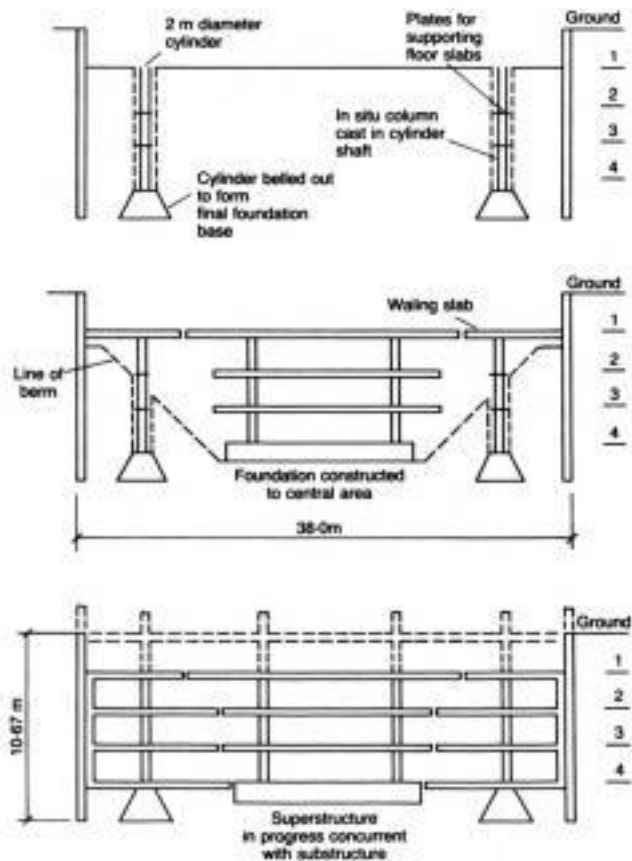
Stages of car park basement construction, Leicester Square, London (Zinn¹²)
